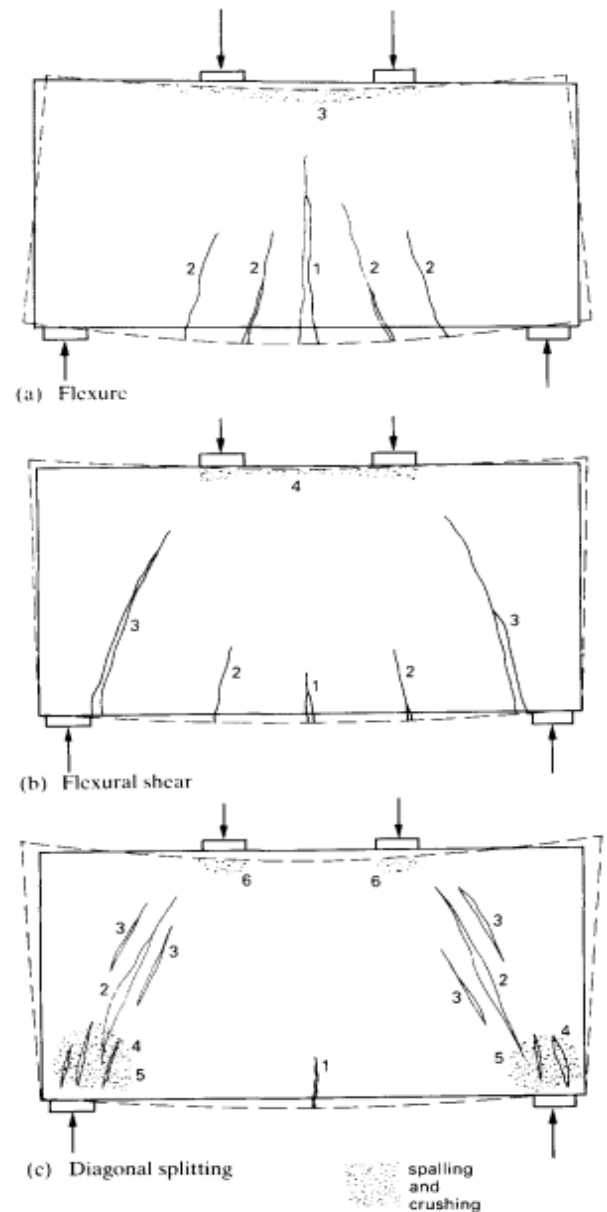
Failure modes of a wall girder [20]
